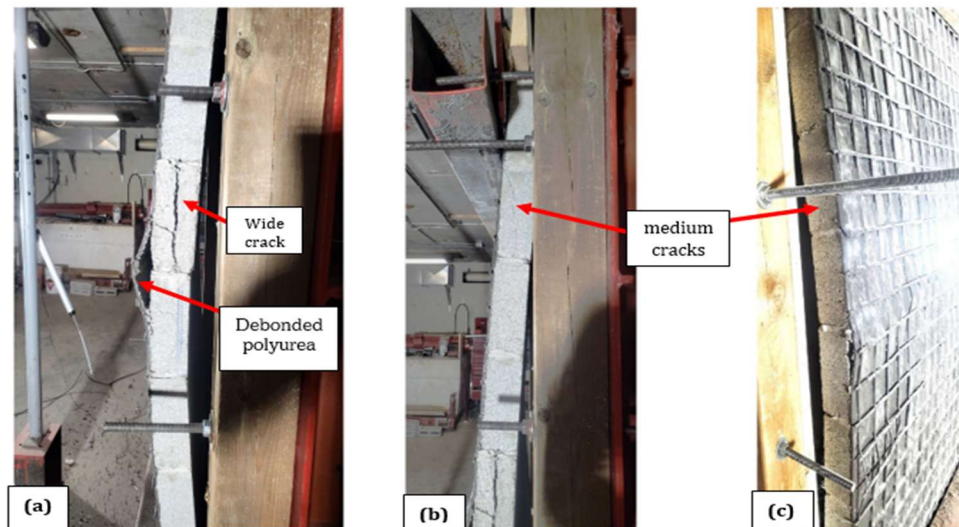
Failure in compression due to arching and slight de-bonding of reinforced polyurea on Wall-3-4
